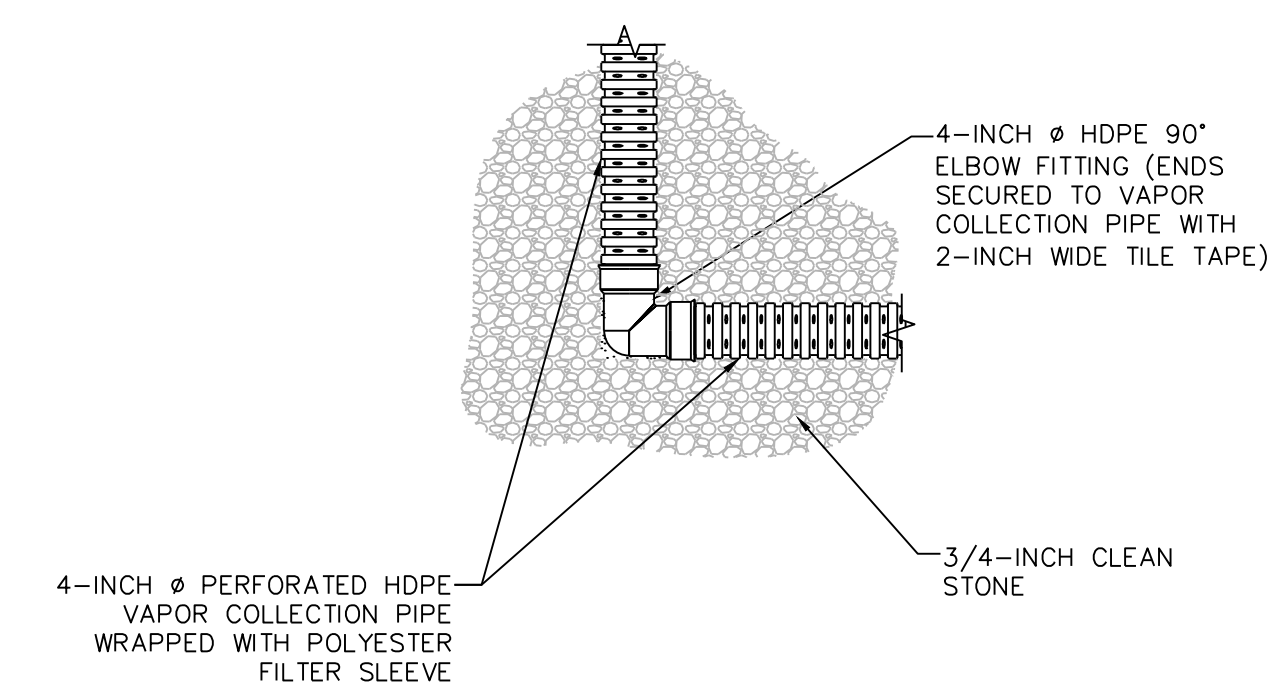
TYPICAL SECTION FOR VAPOR COLLECTION PIPE AND VAPOR BARRIER
